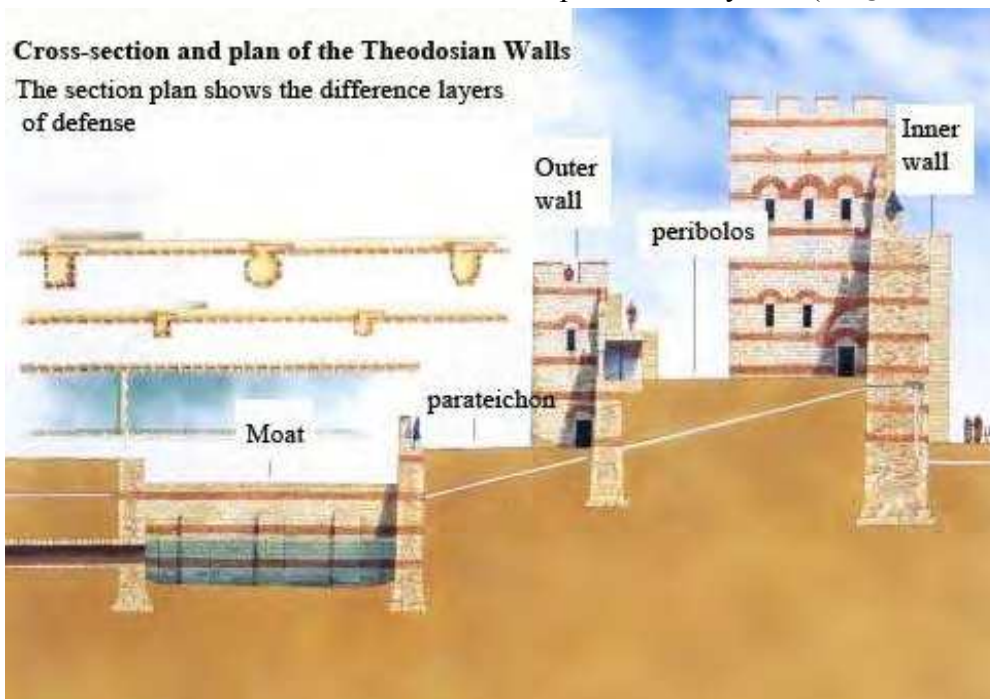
The cross-section and plan of Land Walls, The three defense layers of Theodosian Wall, Source: after Turnbull, S. 2004, *The Walls of Constantinople AD 324-1453*, Osprey Publishing Ltd., p.11, accessed on December 12, 2014.)
